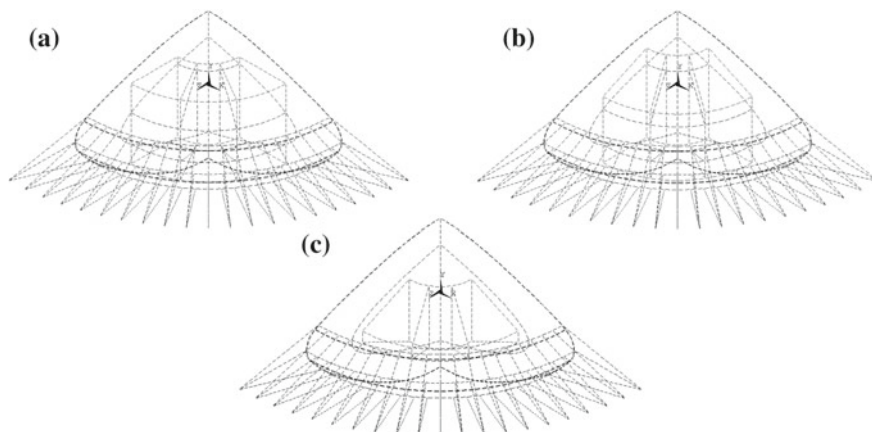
Different cutting patterns which are applied to the lens model, a steering wheel (SW), b CSW cutting pattern, c DCSW cutting pattern
